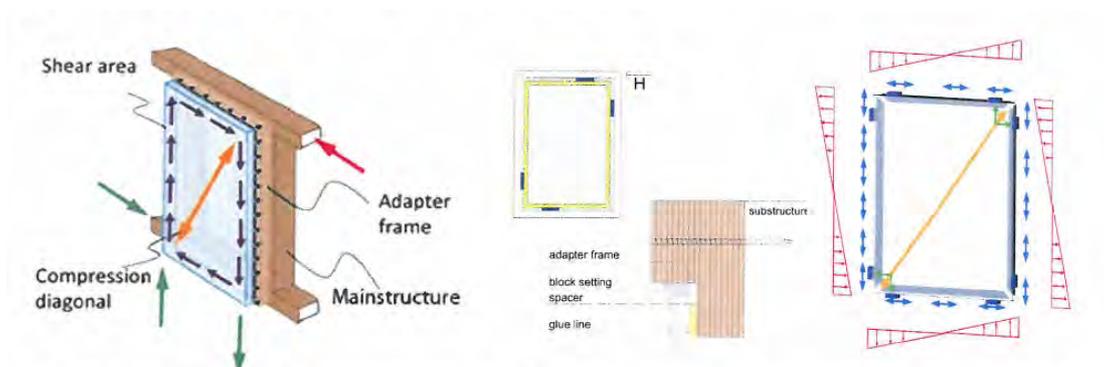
Combination of adhesive bond line and stiff blocks, Prefabrication, load-bearing behavior stressed on shear. Detail with continuous adhesive bond line and with block settings by epoxy only in the corners. Developed and patented by Department of Structural Design and Timber Engineering (IT), Vienna University of Technology (VUT)
